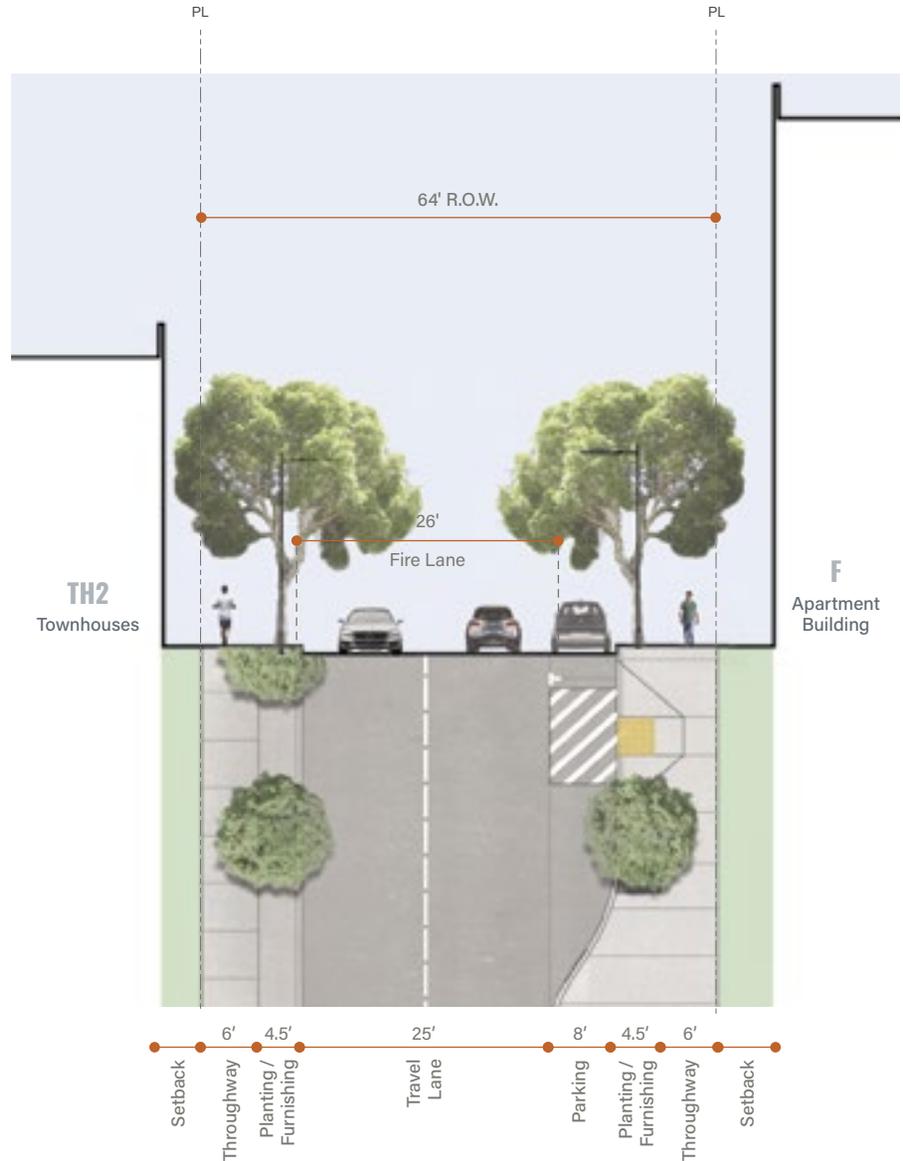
West Street, Section 1 *see "Figure 5.15-2: West Street, Site Plan W.2 & W.3".
